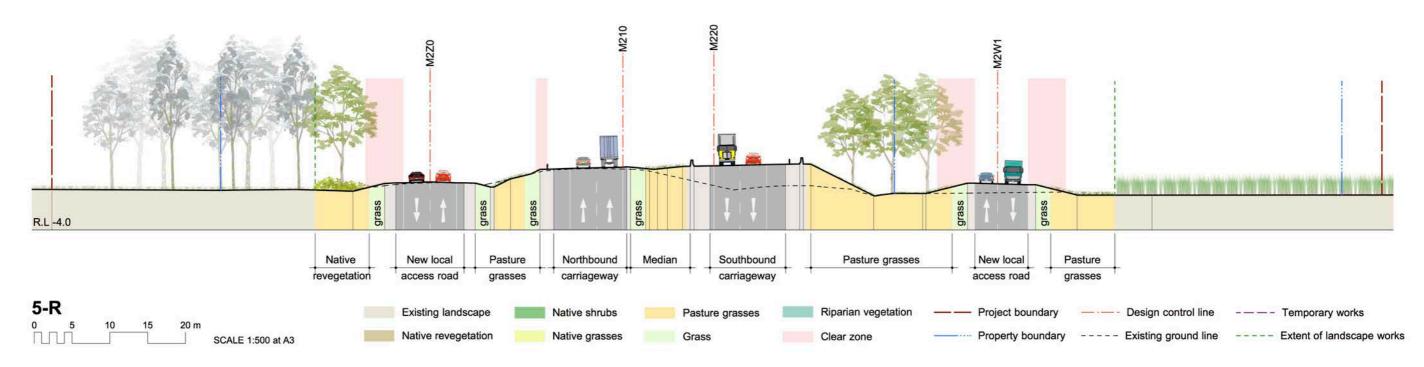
Section 5-R at Clarence Floodplain north of Clarence River North Arm
